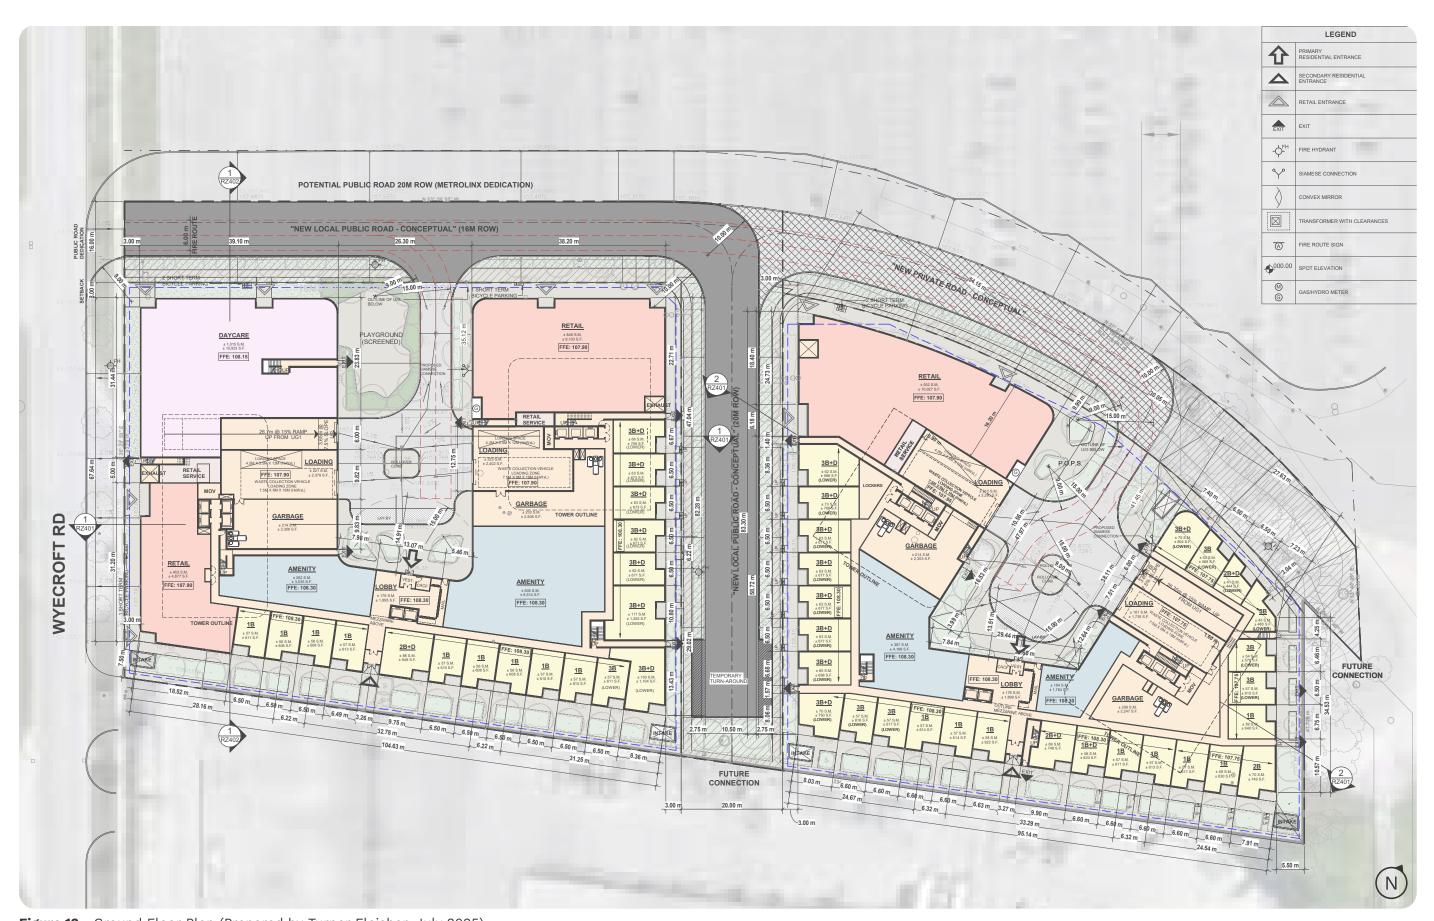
Ground Floor Plan (Prepared by Turner Fleisher, July 2025)
